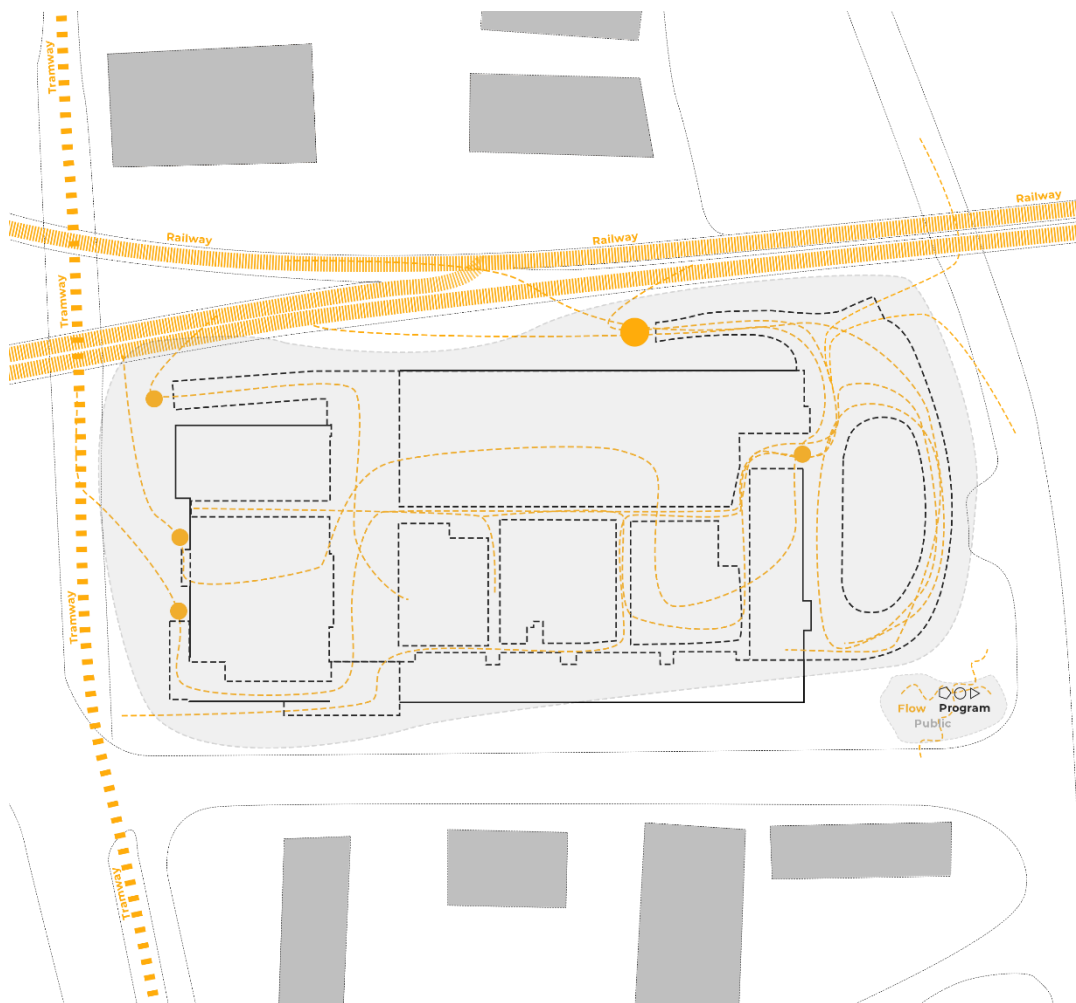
Ground floor plan, showing the flow in Toni Areal.
